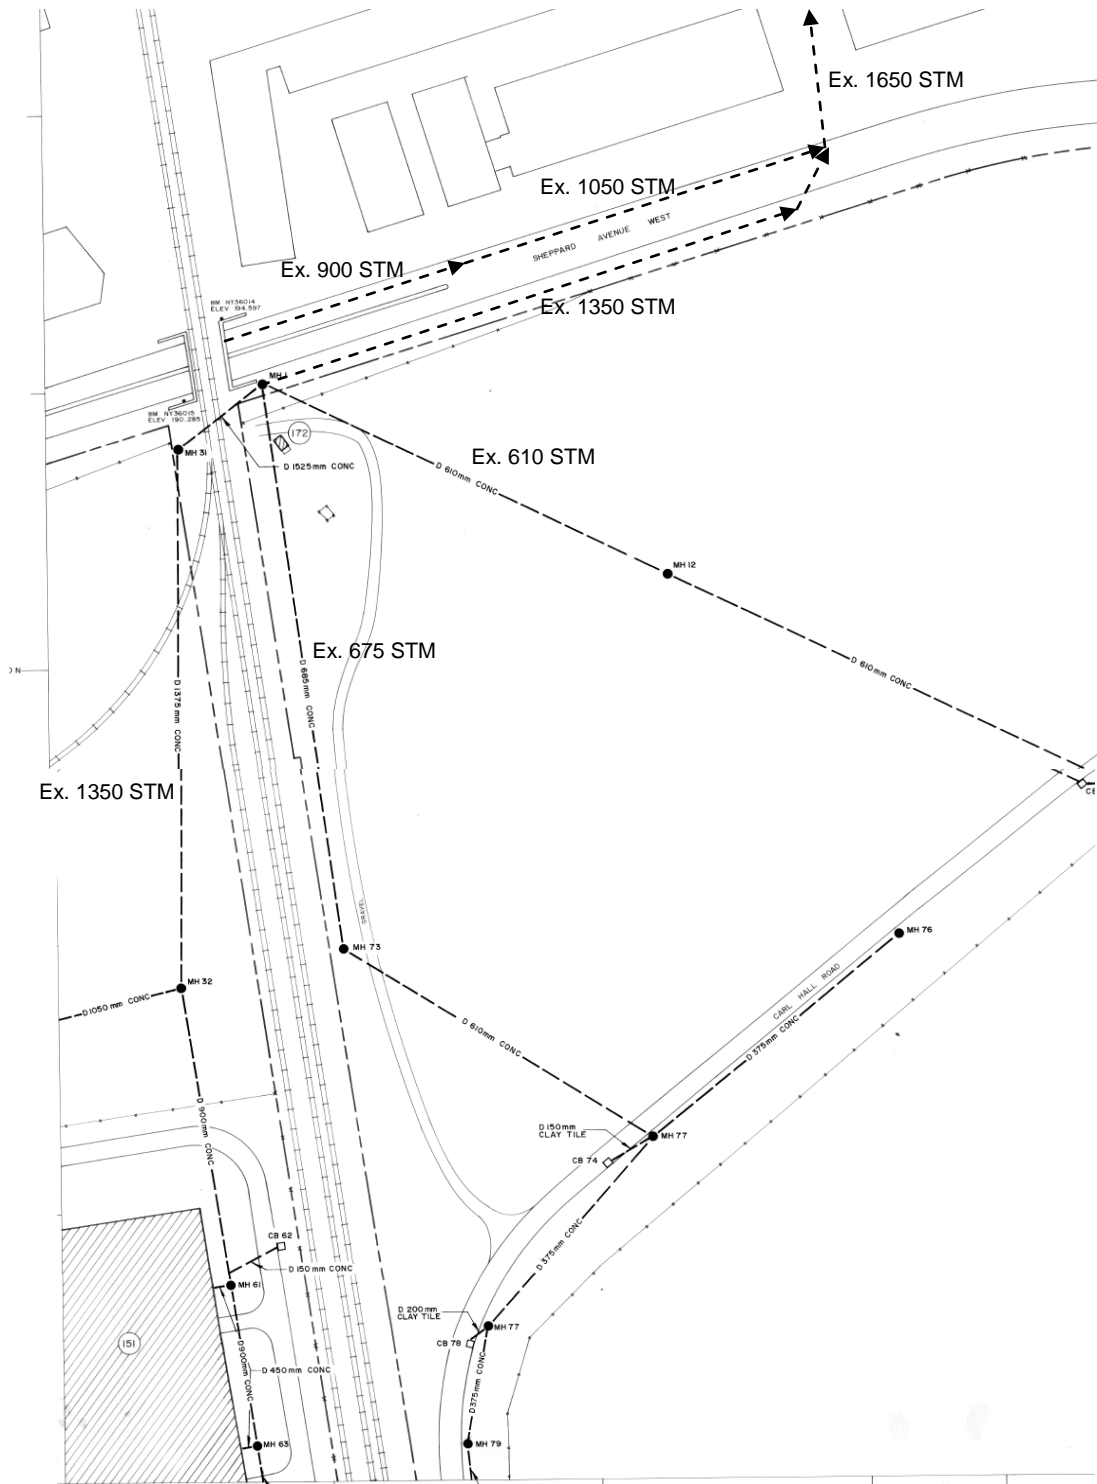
Existing Storm Sewer Drainage, Sheppard West Station Location
